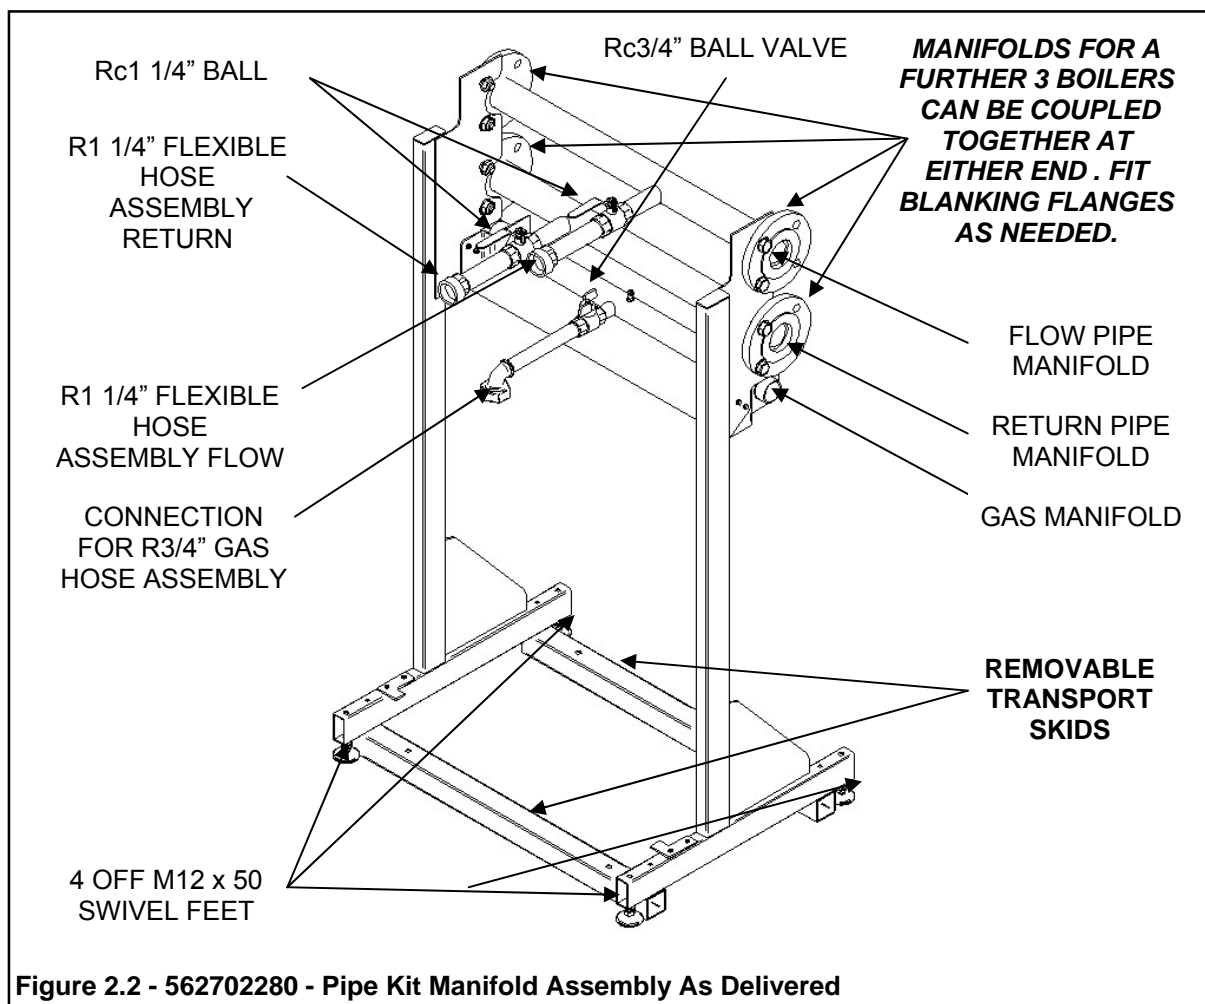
562702280 - Pipe Kit Manifold Assembly As Delivered
